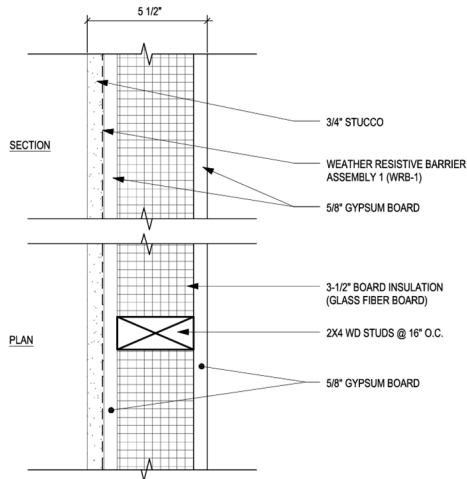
Typical exterior wall construction assembly based on ASHRAE 90.1-2010 minimum standards
